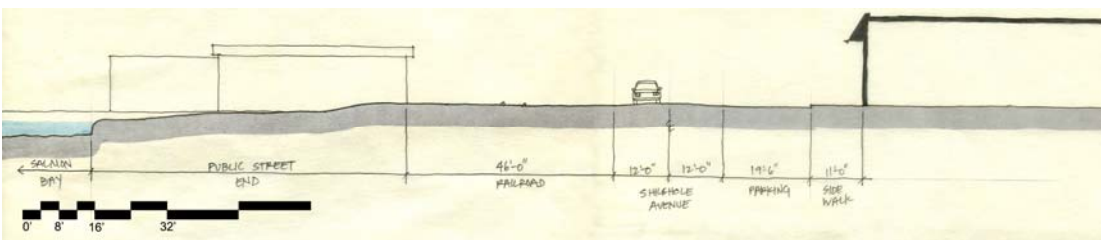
Existing site section from Salmon Bay across Shilshole Avenue through the Public Street End, showing the dimension of Shilshole Avenue.
